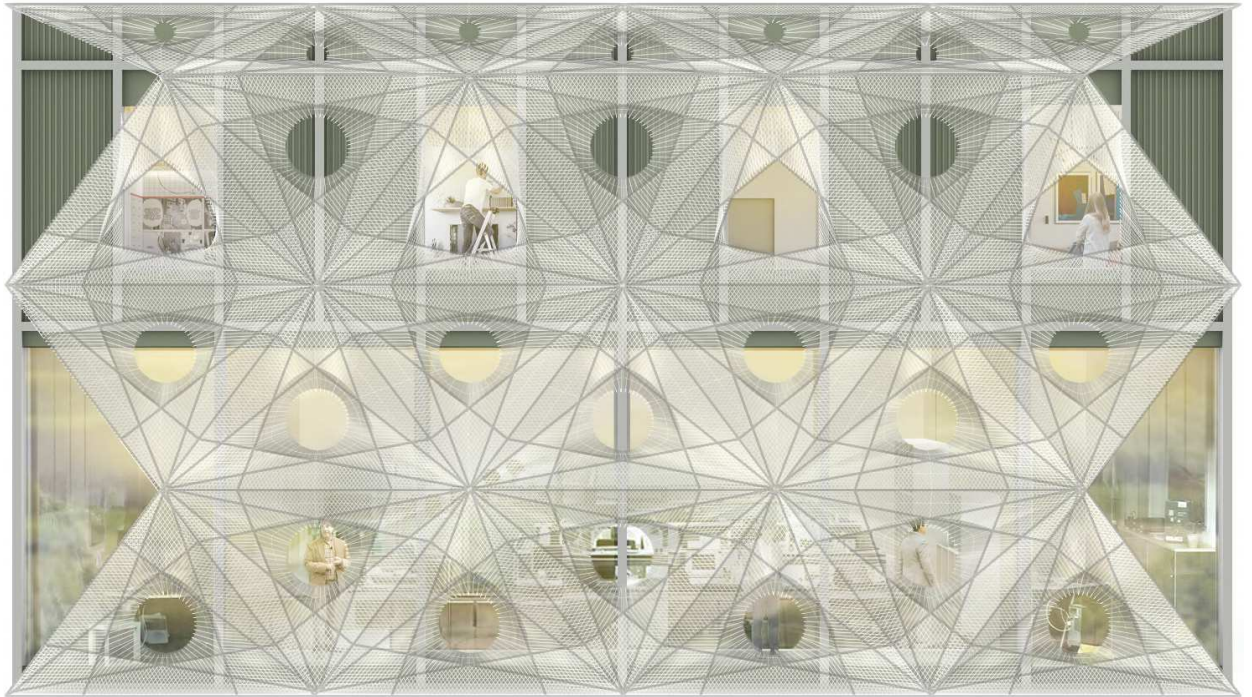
represents fiber wings, serving as the 2nd structural element of the Kinetic Woven Facade and enabling shading by diffusing direct sunlight, thereby protecting the inner building space from overheating.
